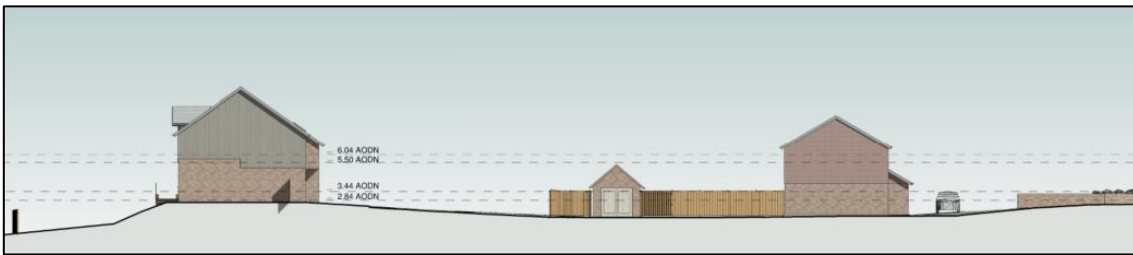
Proposed side elevation and site section (1/2 Willop Close to right, proposed house to left)
